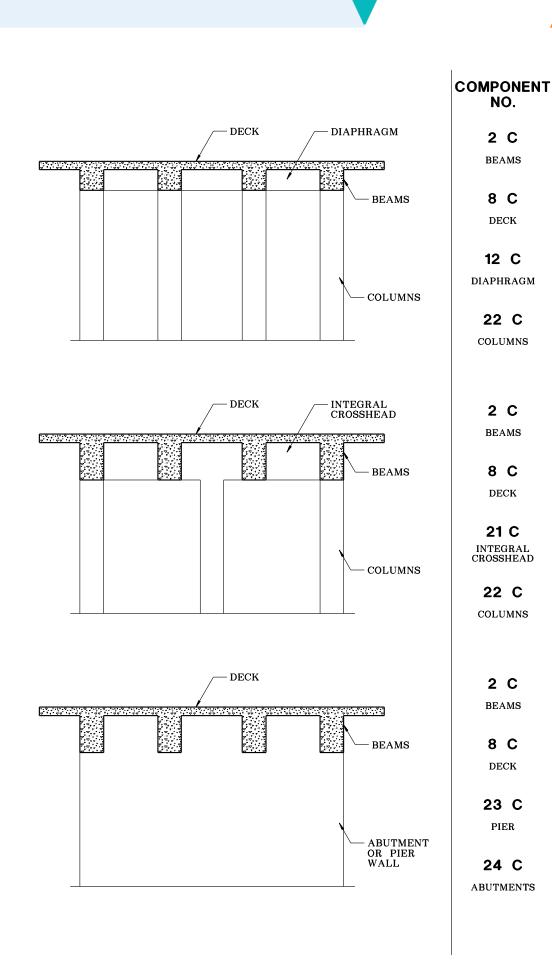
CAST - INSITU MONOLITHIC R.C. T-BEAM BRIDGES
